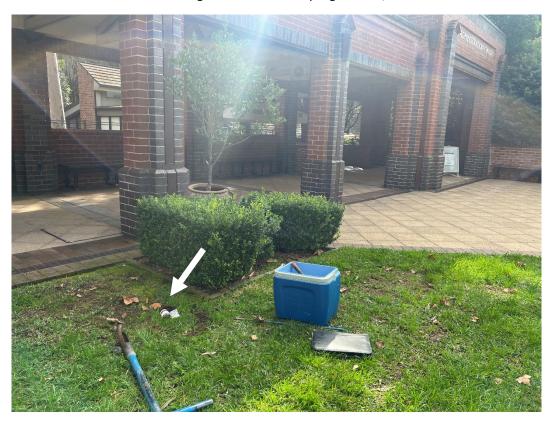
Showing borehole WC9 sampling location, looking north, 16.05.2024.
